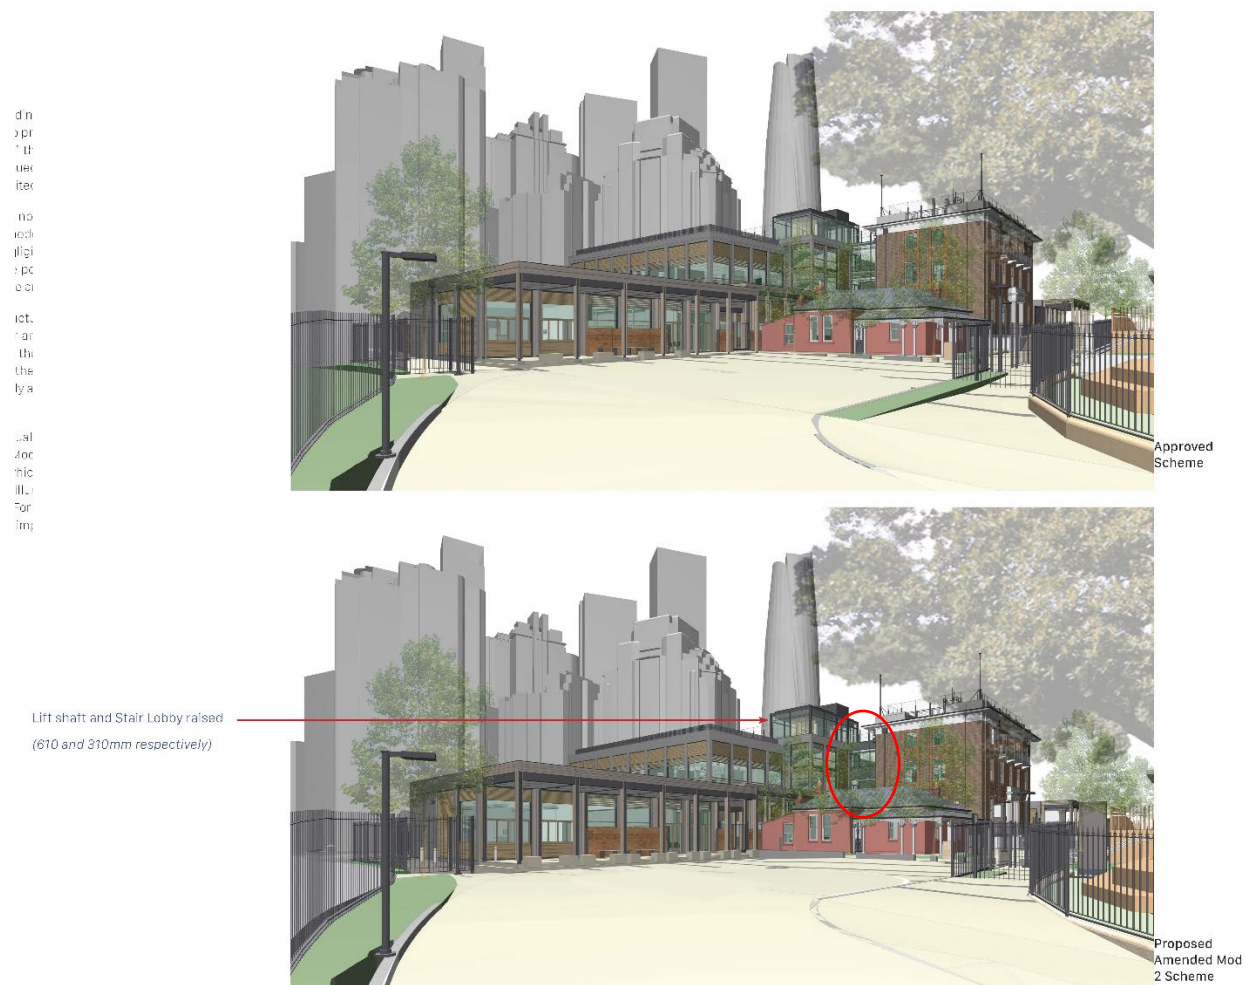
Comparison of views looking southwest towards the approved s4.55 Mod 1 designs (top) and proposed amended s4.55 Mod 2 scheme (bottom) showing raised lift shaft overrun and stair lobby. Proposed modifications to the footbridge bridge between Buildings J + M circled in red. Source. FJMT, 17 October 2022.
